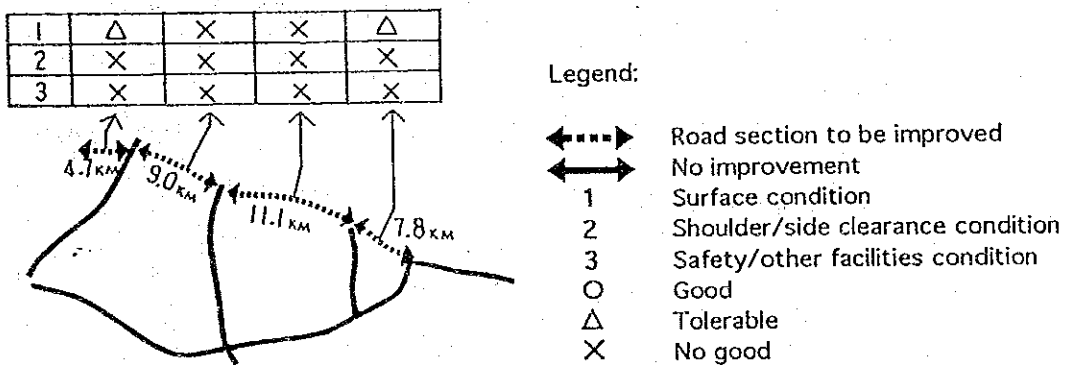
Existing Road Condition and Improvement Plan of Phetchaburi Coastal Road
